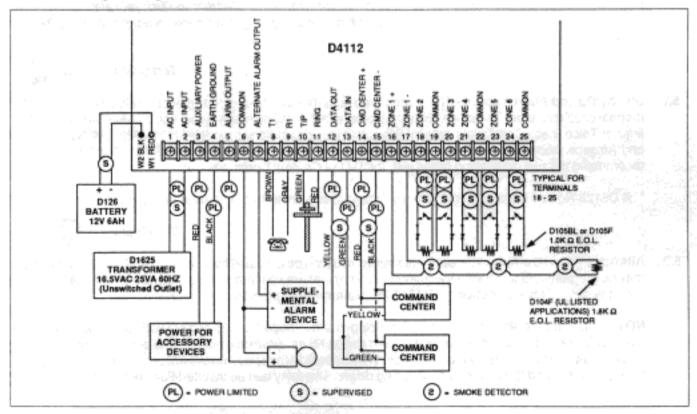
TYPICAL D4112 SYSTEM INSTALLATION
